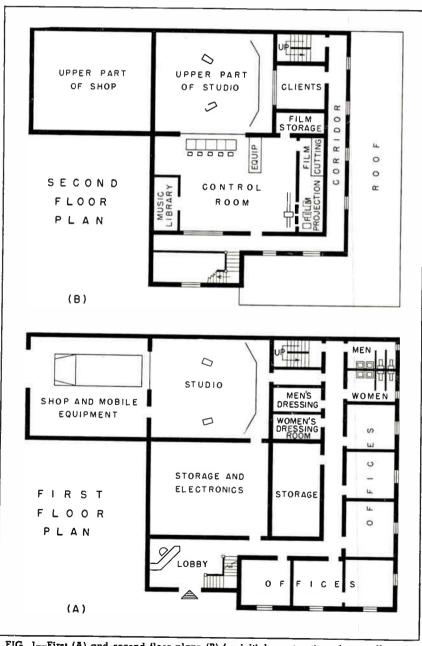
First (A) and second floor plans (B) for initial construction of a small station
